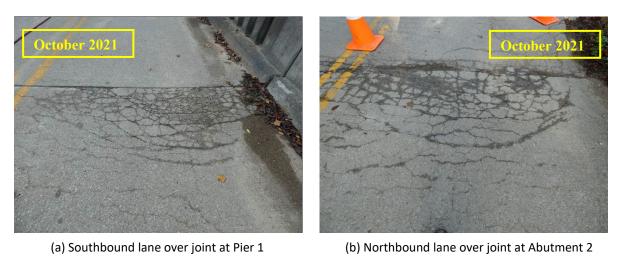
Cracking Observed on 023B00040N Bridge Deck
